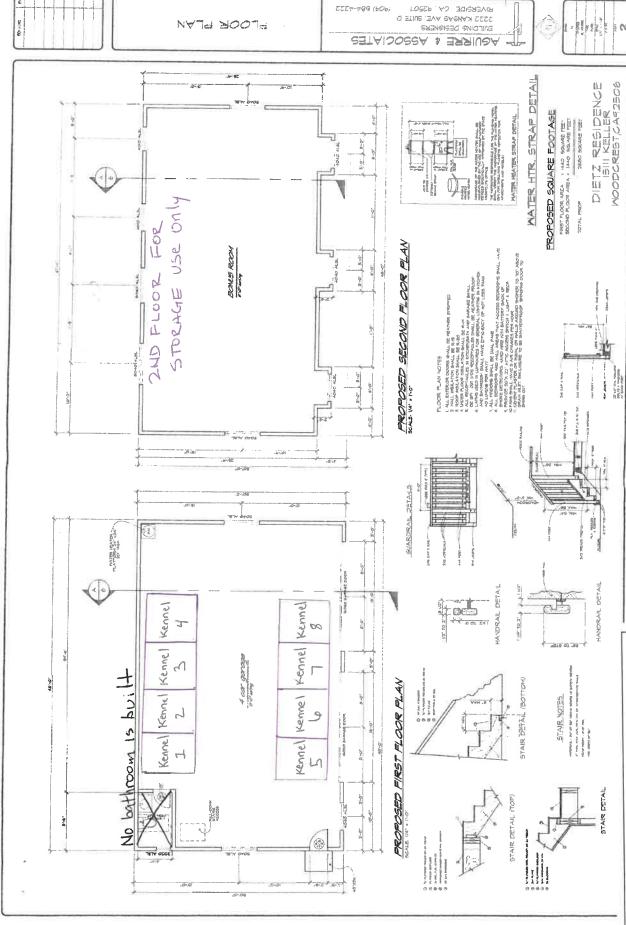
EXHIBIT C: Floor Plan PLANNER: T. Wheeler
